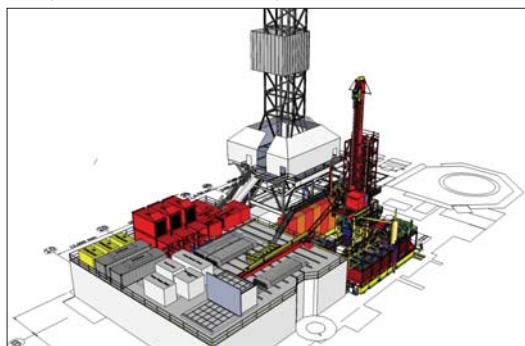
First offshore modular rack and pinion sidetrack drilling unit
